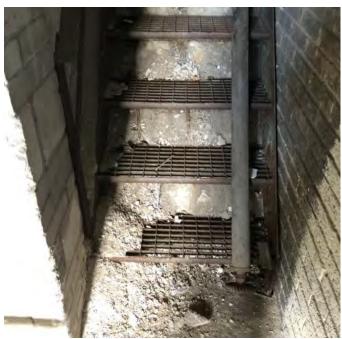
INTERIOR PLASTER HAS CRUMBLED FROM THE WALLS, CEILING AND STRINGER BEHIND THE STAIR (LEADS TO THE ROOTOP EXIT)
